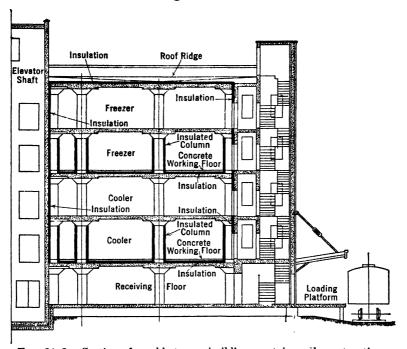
Section of a cold storage building, curtain wall construction.
